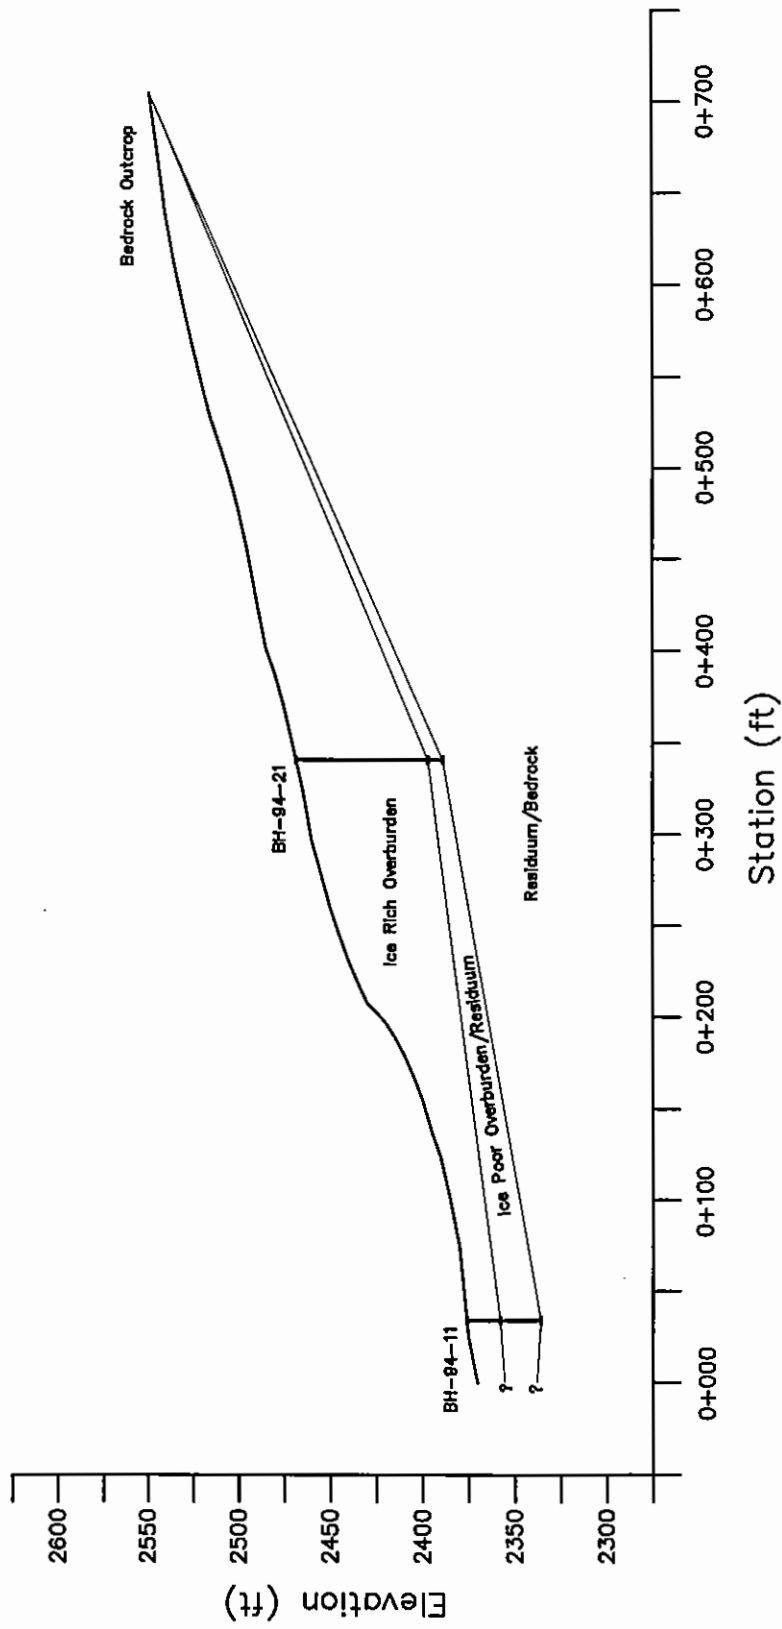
CROSS SECTION OF BACK-ANALYZED EXISTING SLOPE
